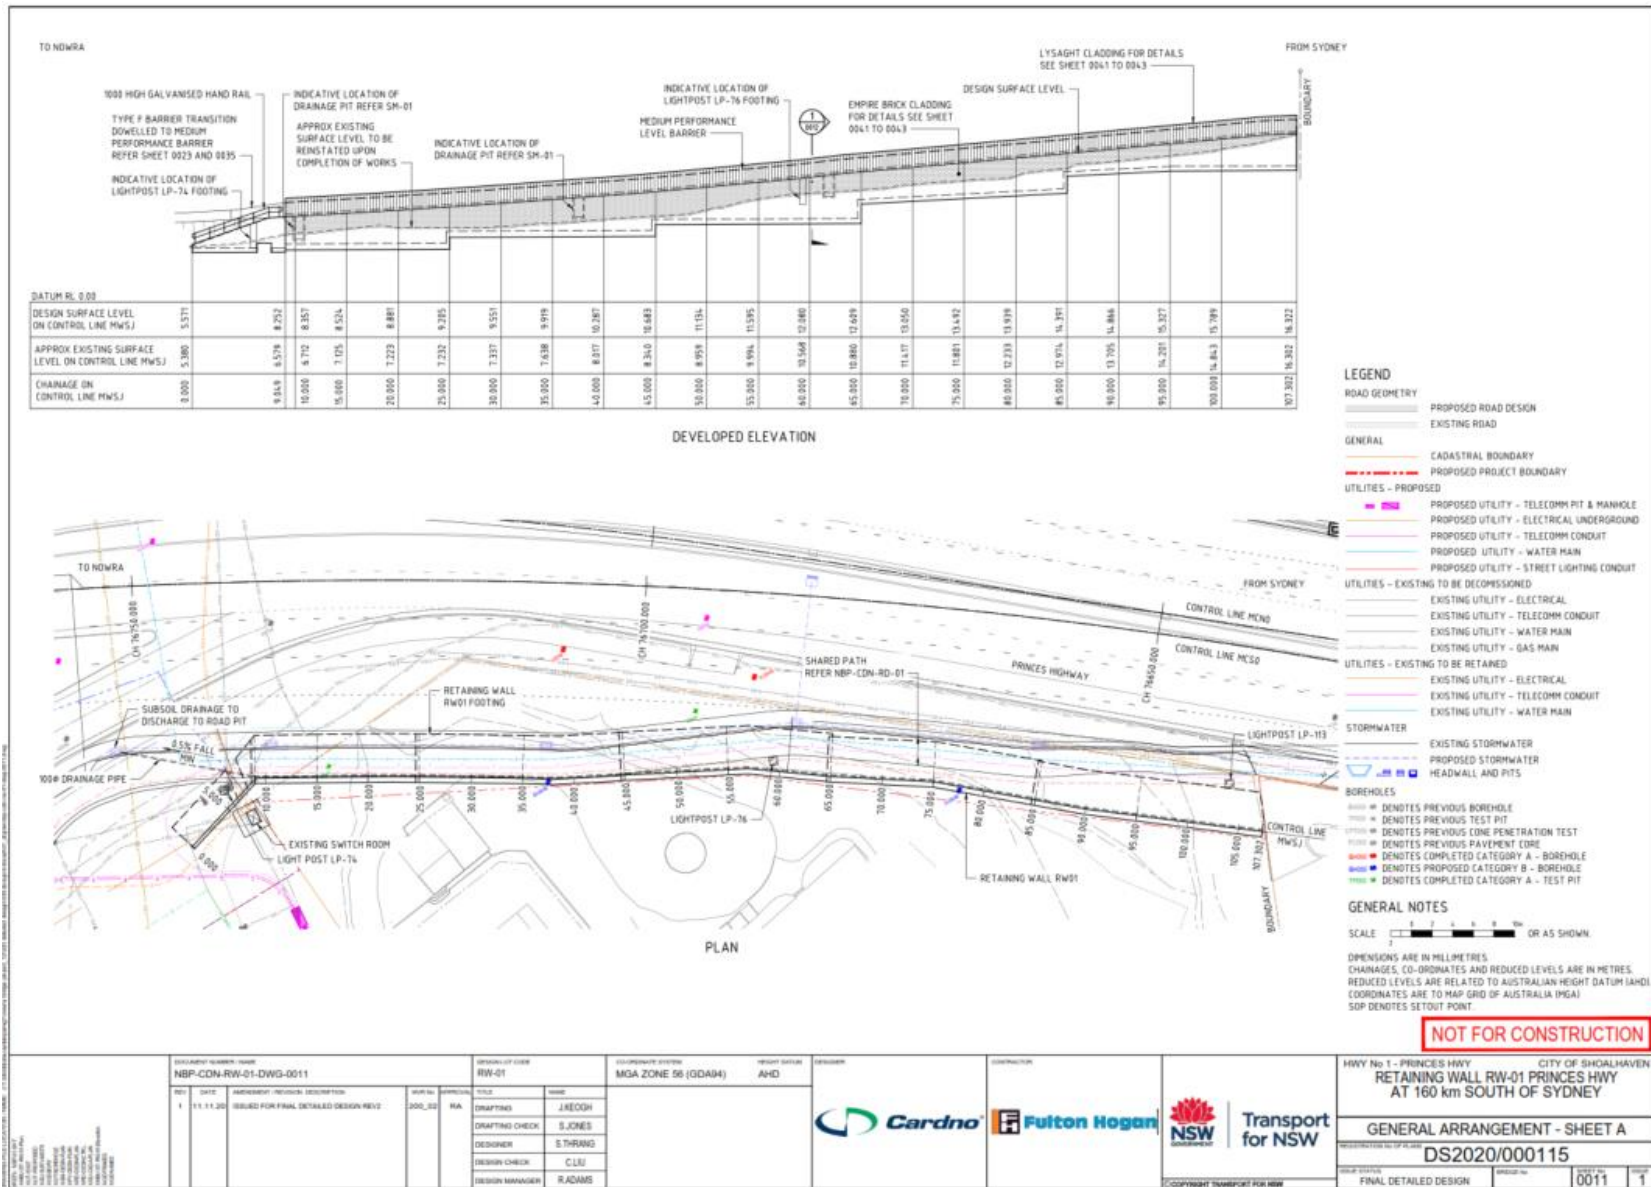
Longitudinal plan for the proposed retaining wall. Source: TfNSW
